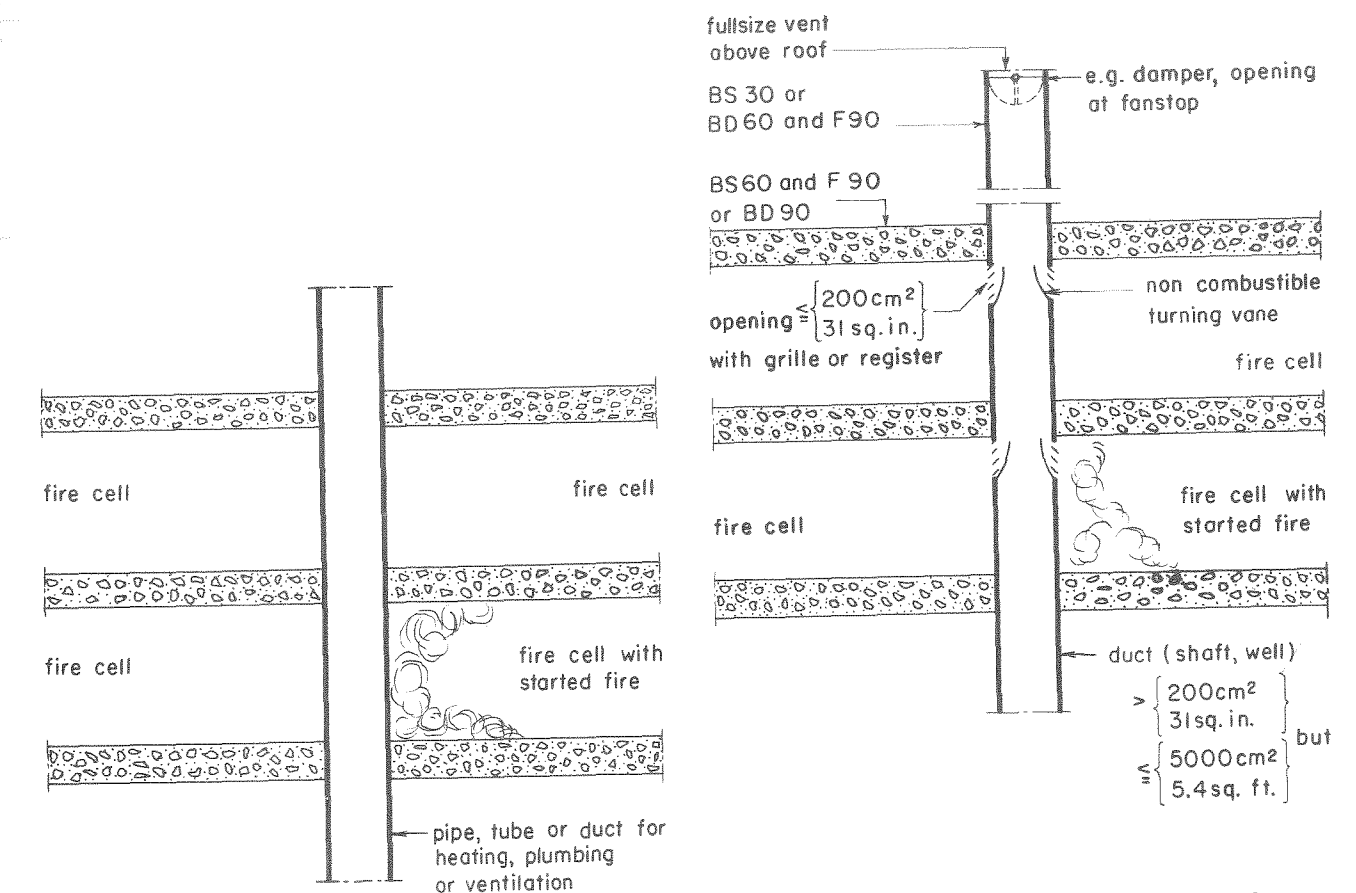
Sectional elevation of multistorey dwelling house with fire
